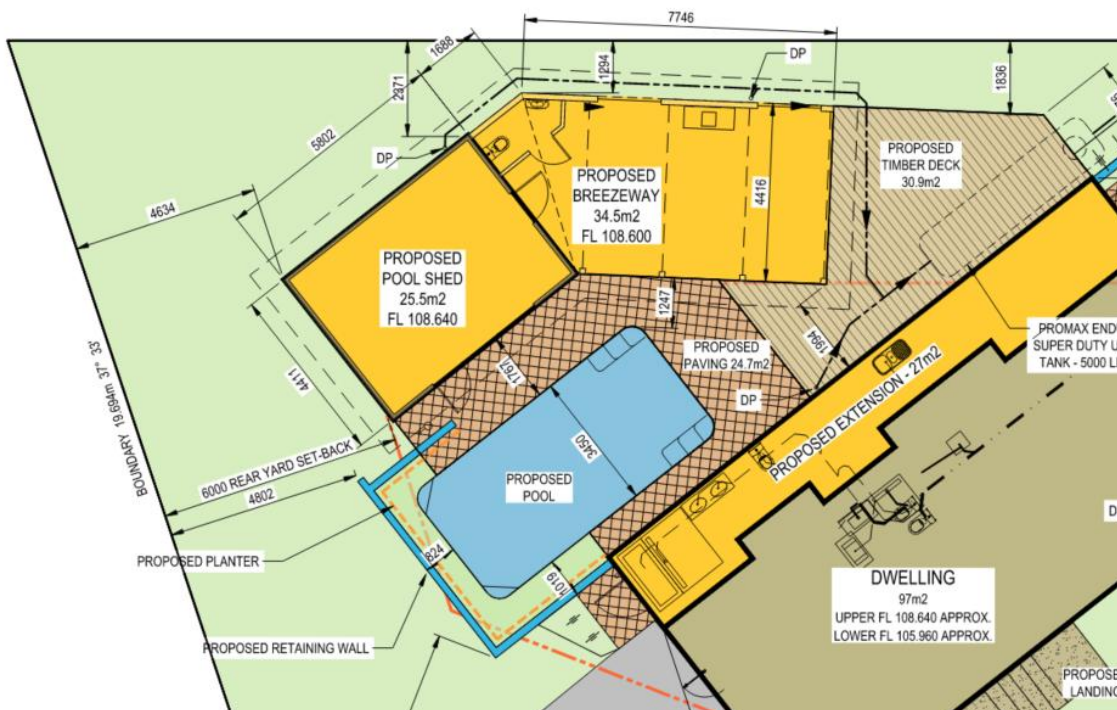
Screenshot from Architectural Drawings showing Proposed Layout
